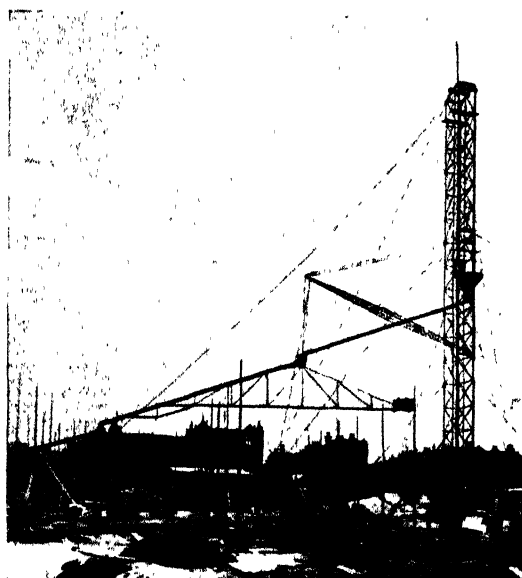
"INSLEY" CONCRETE PLACING PLANT
